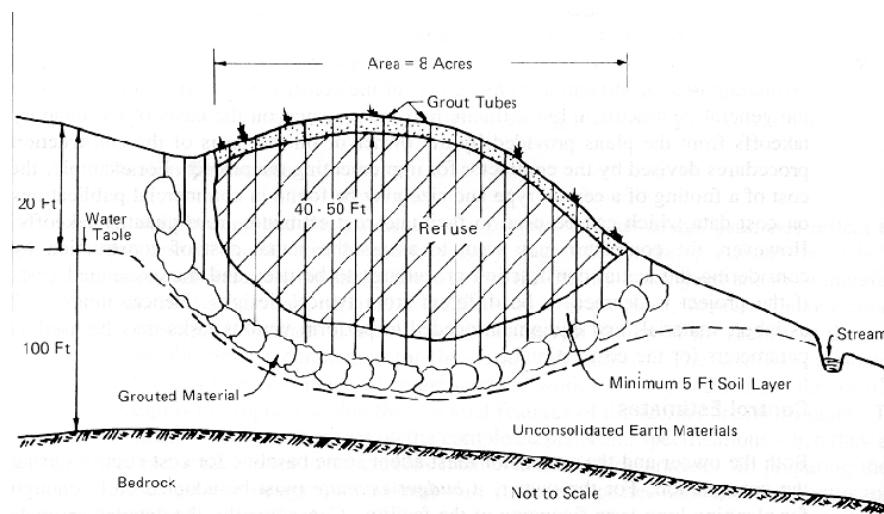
Grout Bottom Seal Liner at a Landfill
